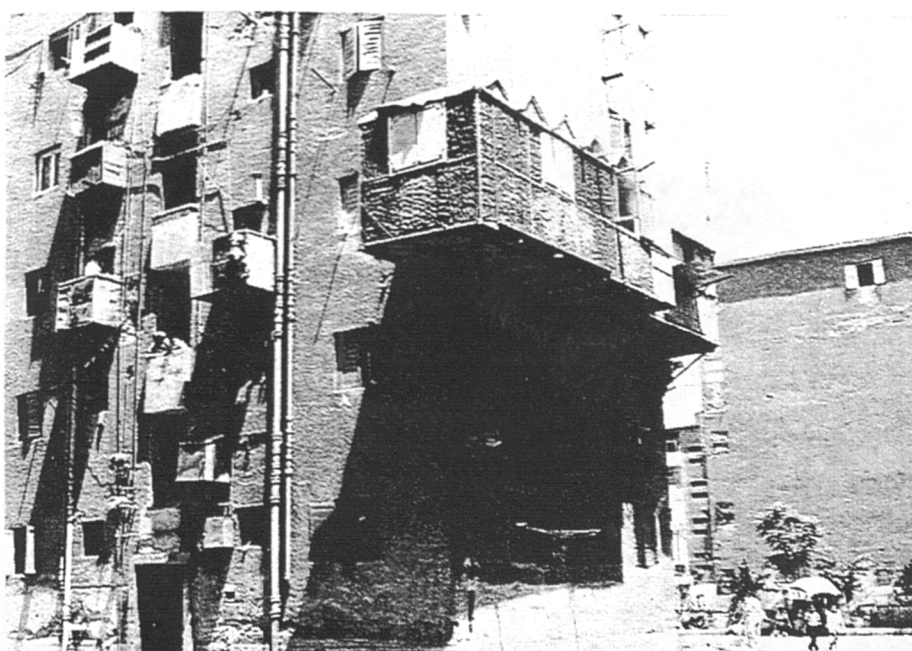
The plan Abou Nabil's housing unit. A projecting extension using a steel framed structure constructed by Nabil himself. The extension looked striking yet structurally precarious.
